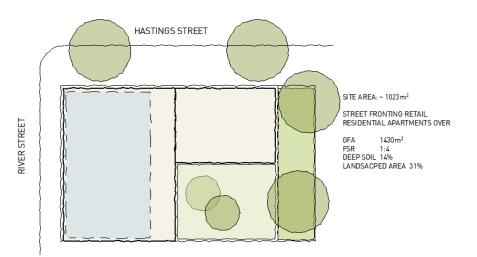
TESTING ON EASTERN SIDE OF RIVER STREET WITH MIXED USE DEVELOPEMNT ON CORNER SITE
